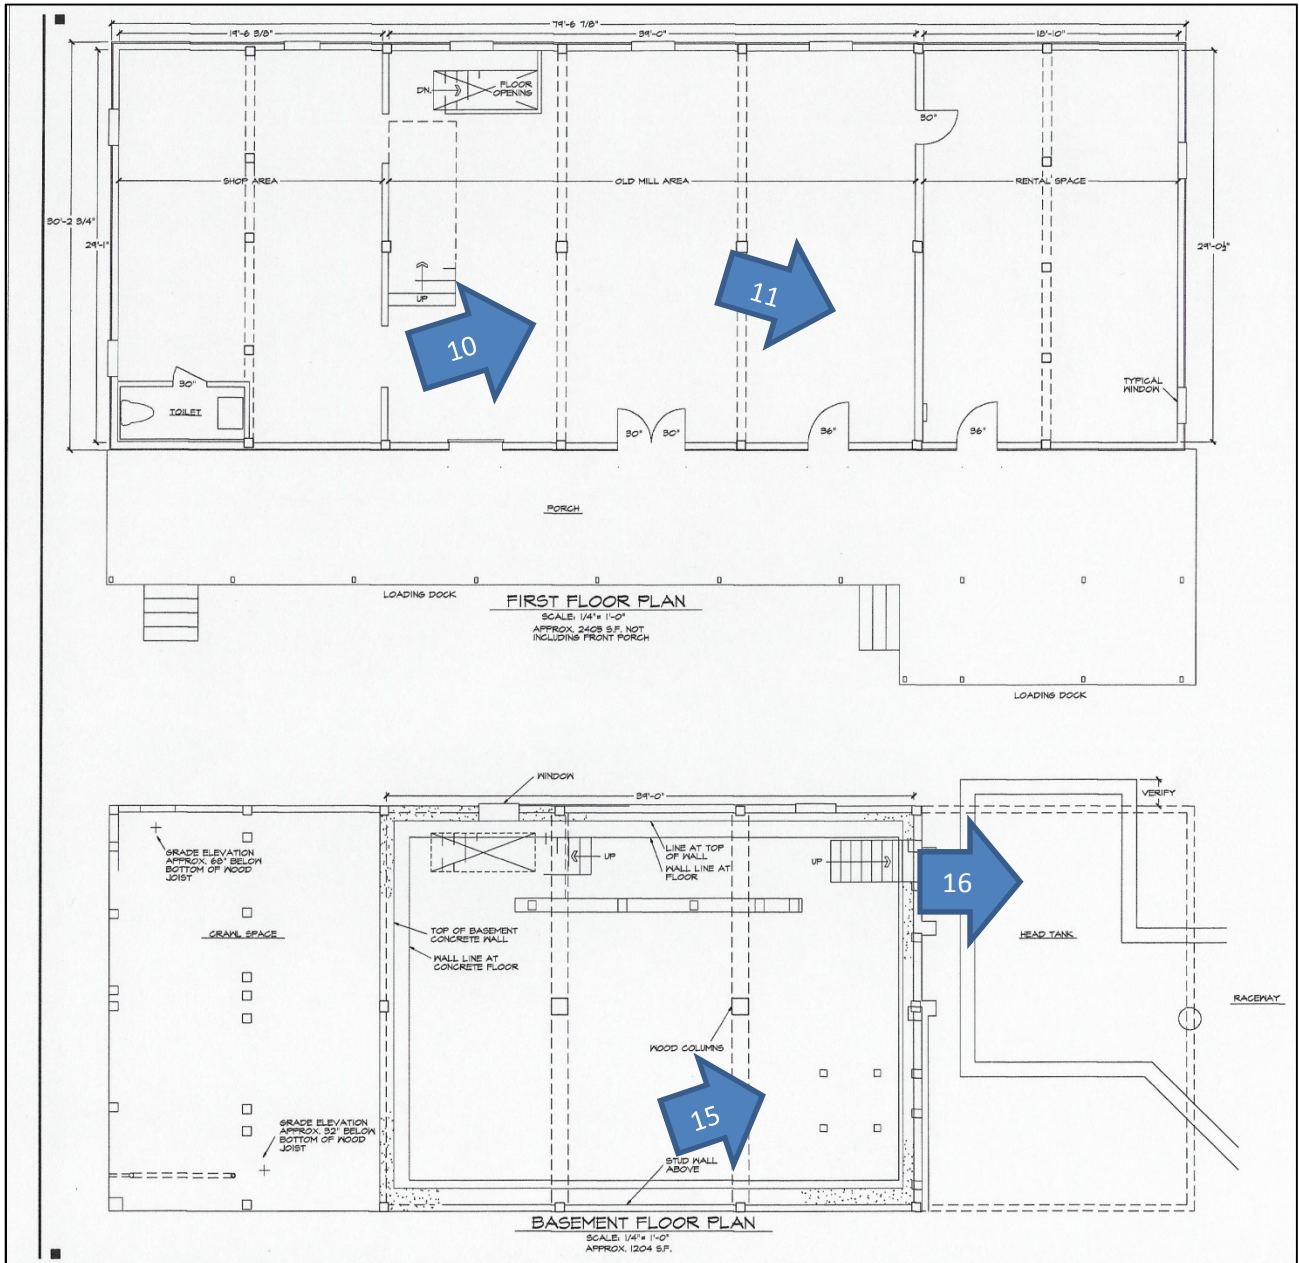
Keyed Basement and First Floor Plan of Reed Creek Mill.
